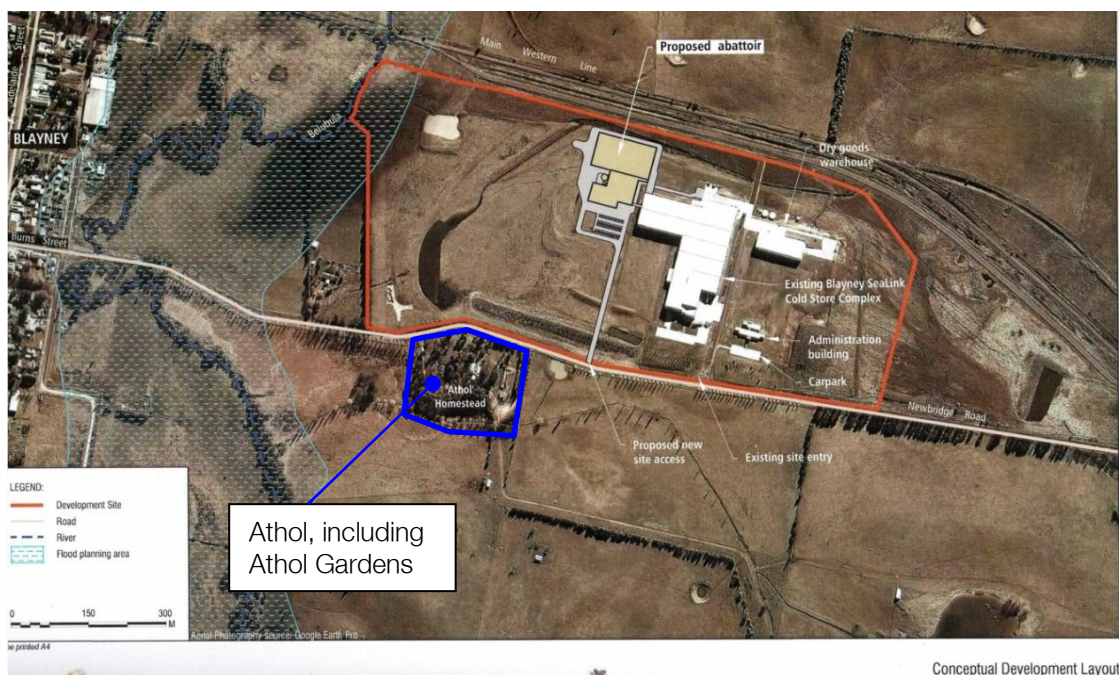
Relationship of subject site and “Athol” fronting Newbridge Rd and opposite the feral goat abattoir (Source: SLR Consulting)
